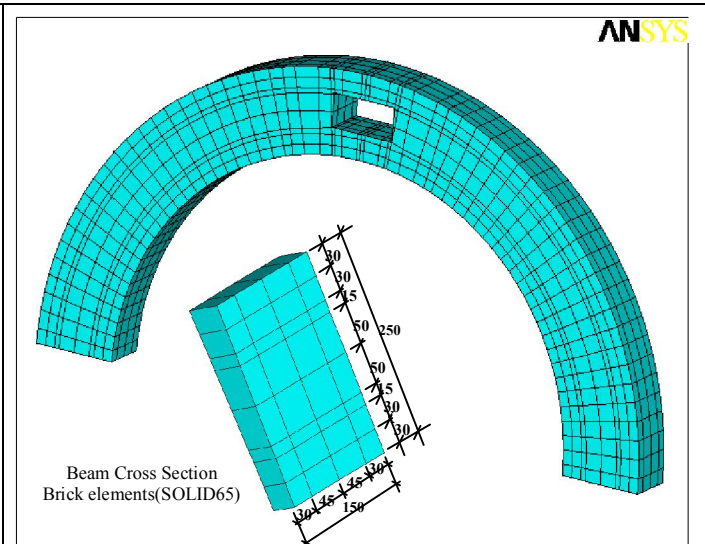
b: Mesh Modeling of Tested Concrete Arches with Opening
